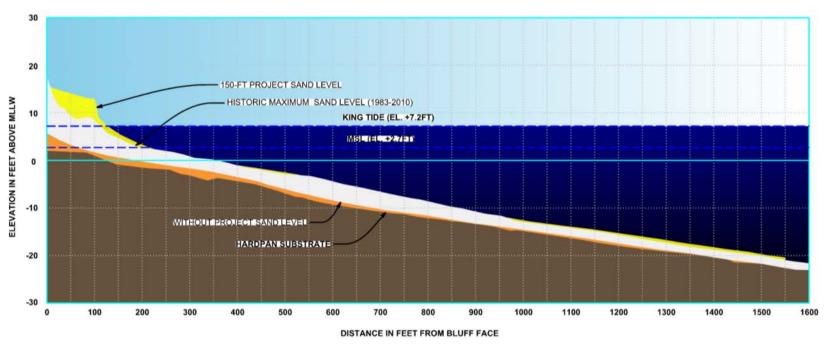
Solana Beach (SB-1B) Segment Typical Beach Profile (150' MSL) Plan
